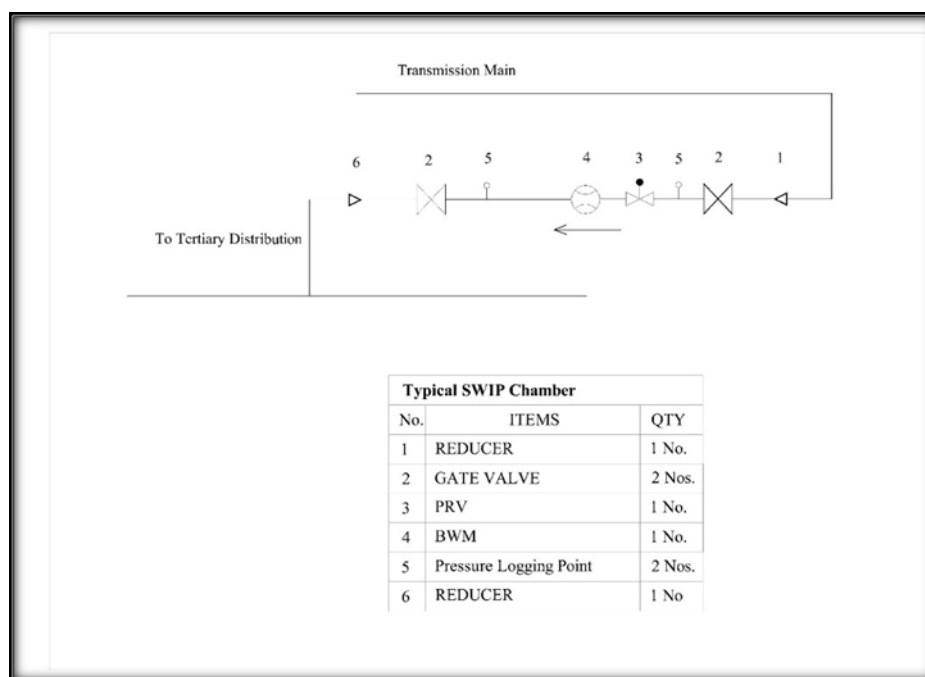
Details of Typical Surface Water Interconnection Chamber
